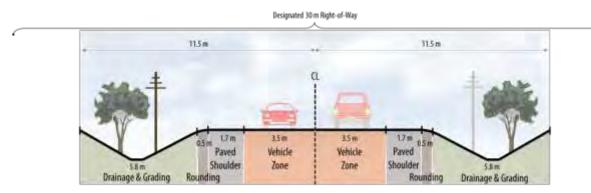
11.4 m Platform Rural Cross-Section for Olde Base Line Road
